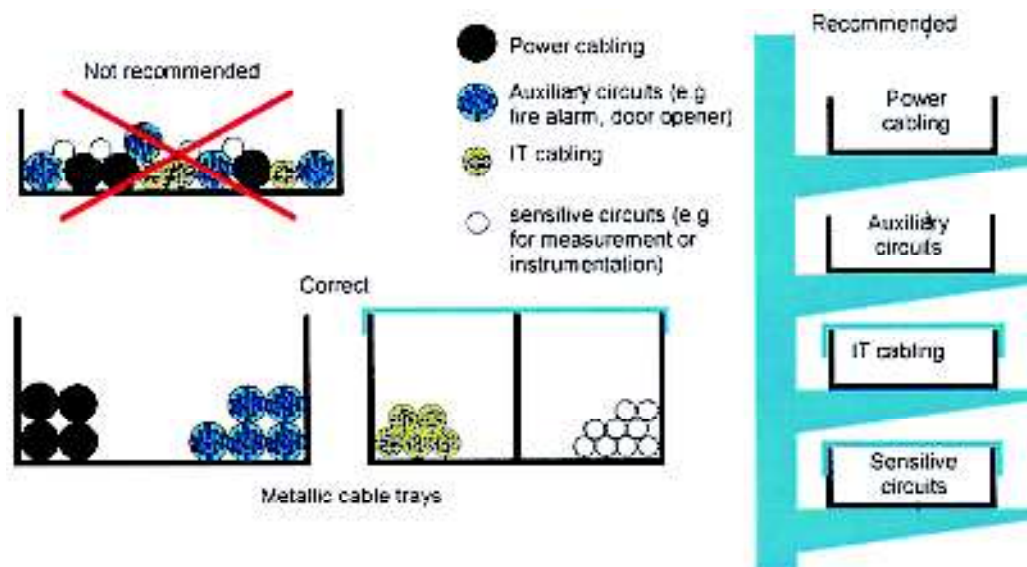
SEPARATION OF CABLES IN WIRING SYSTEMS
